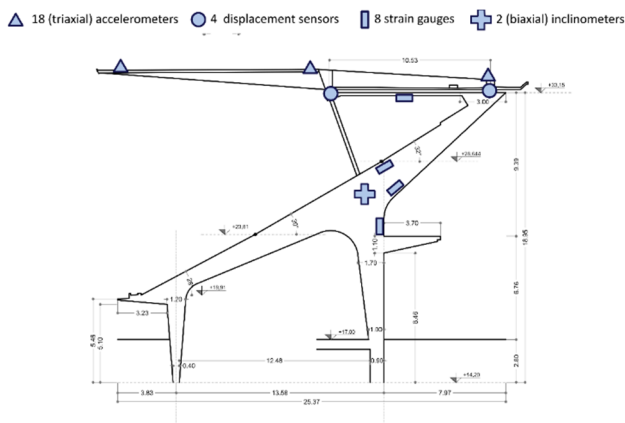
Sensors placement: elevation view of one frame of the stadium (dimensions are in meters)
